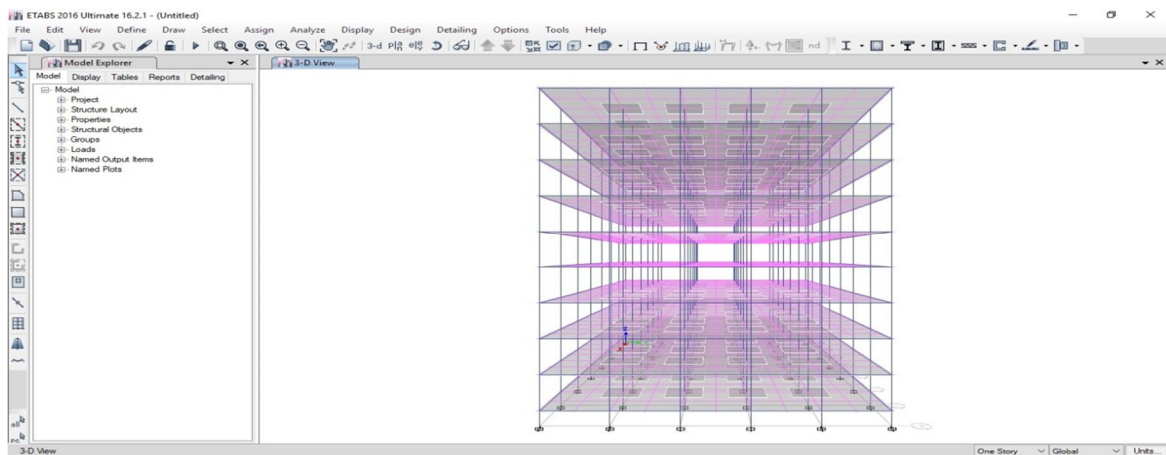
3D (Elevation) View of flat slab with perimeter beams.
